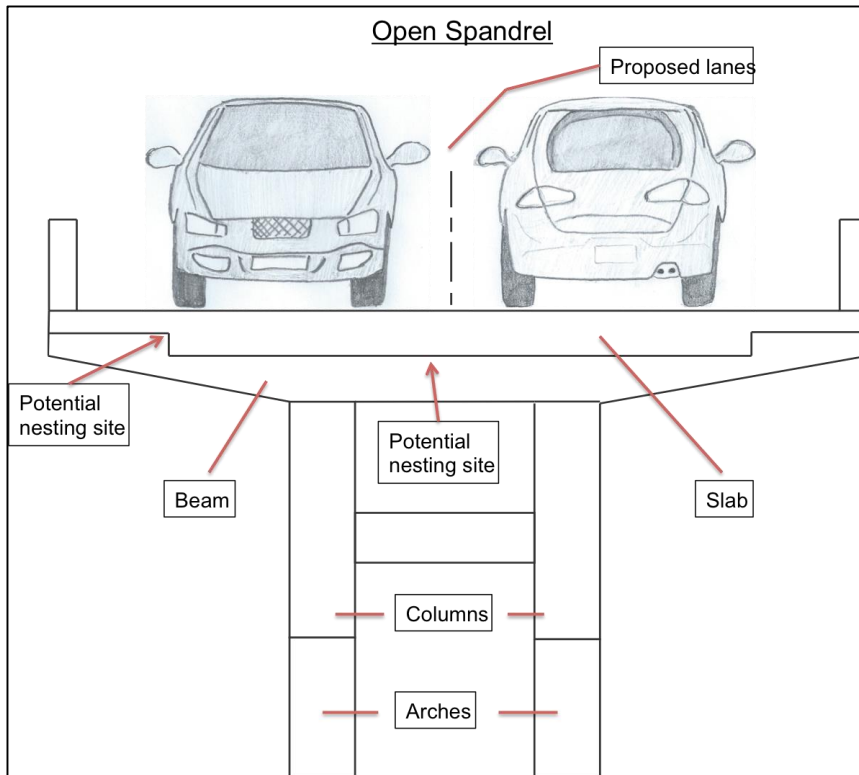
Cross-section of an open spandrel bridge with potential nesting sites
